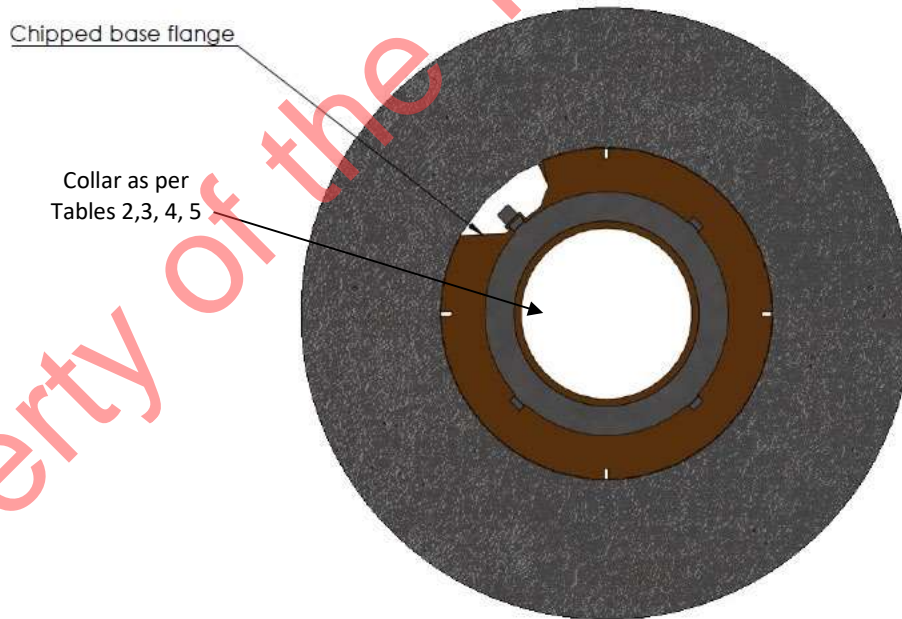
Collar flanges that are damaged or partially removed on the plastic base flange
